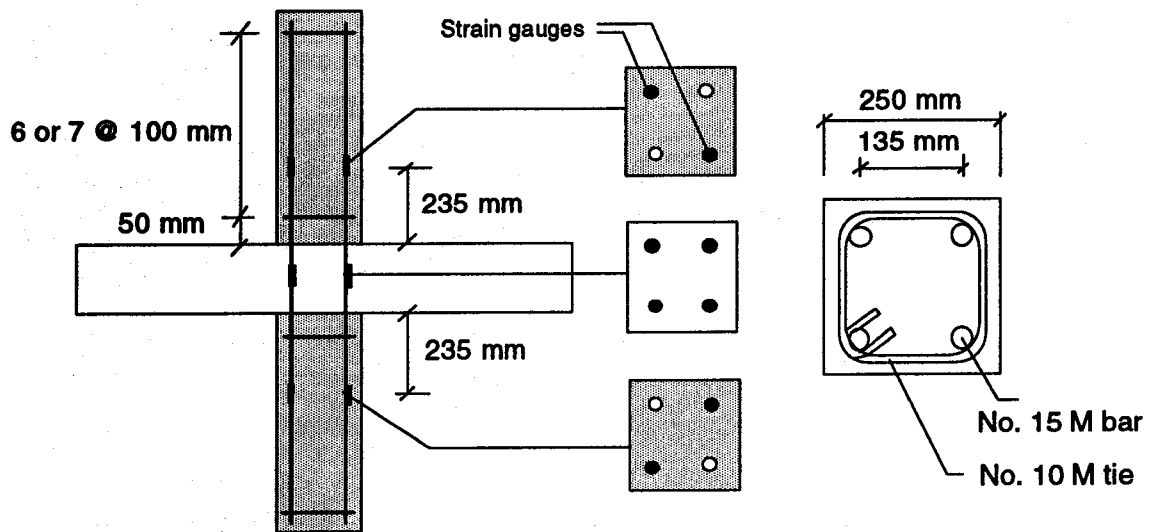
Column Reinforcement and Strain Gauge Layout (Series B Specimens)
